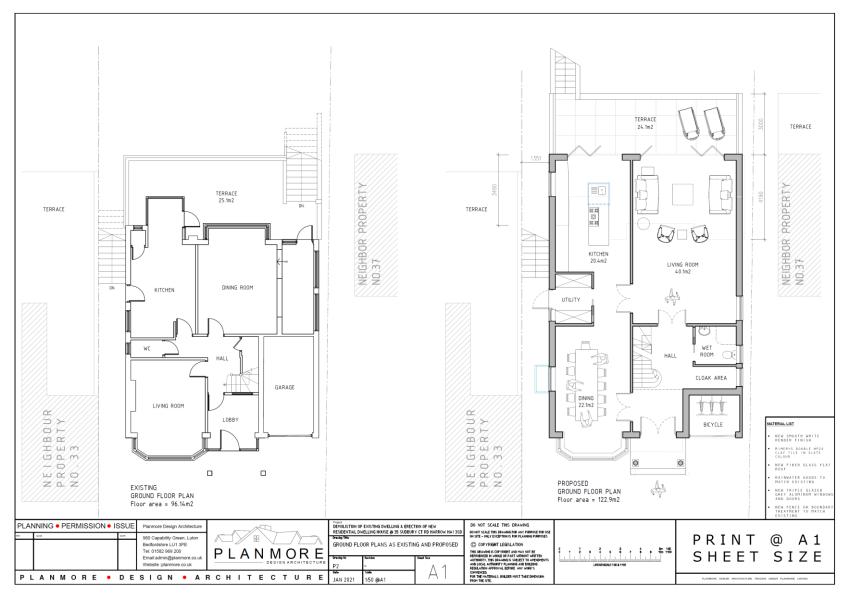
Proposed Ground Floor Plan (Reproduced by courtesy of Planmore)
